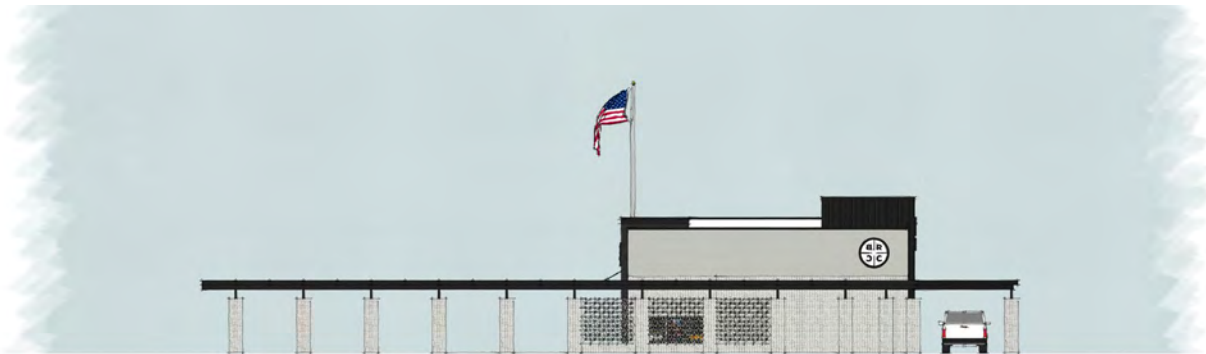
shows the proposed 75% building frontage as seen from 400 N.
